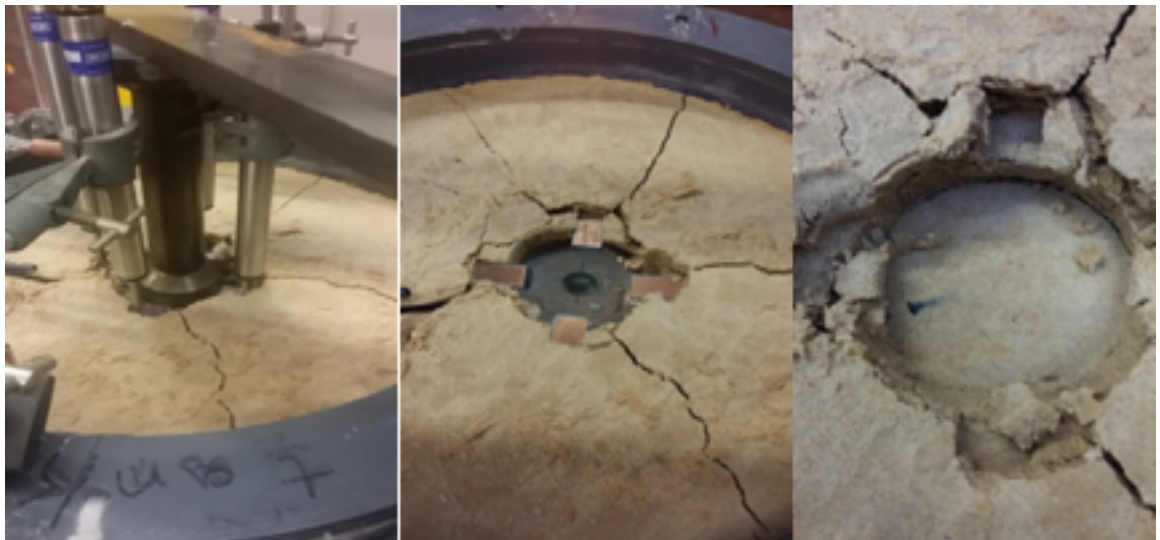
Photographs showing the footing failure in Case 1.
